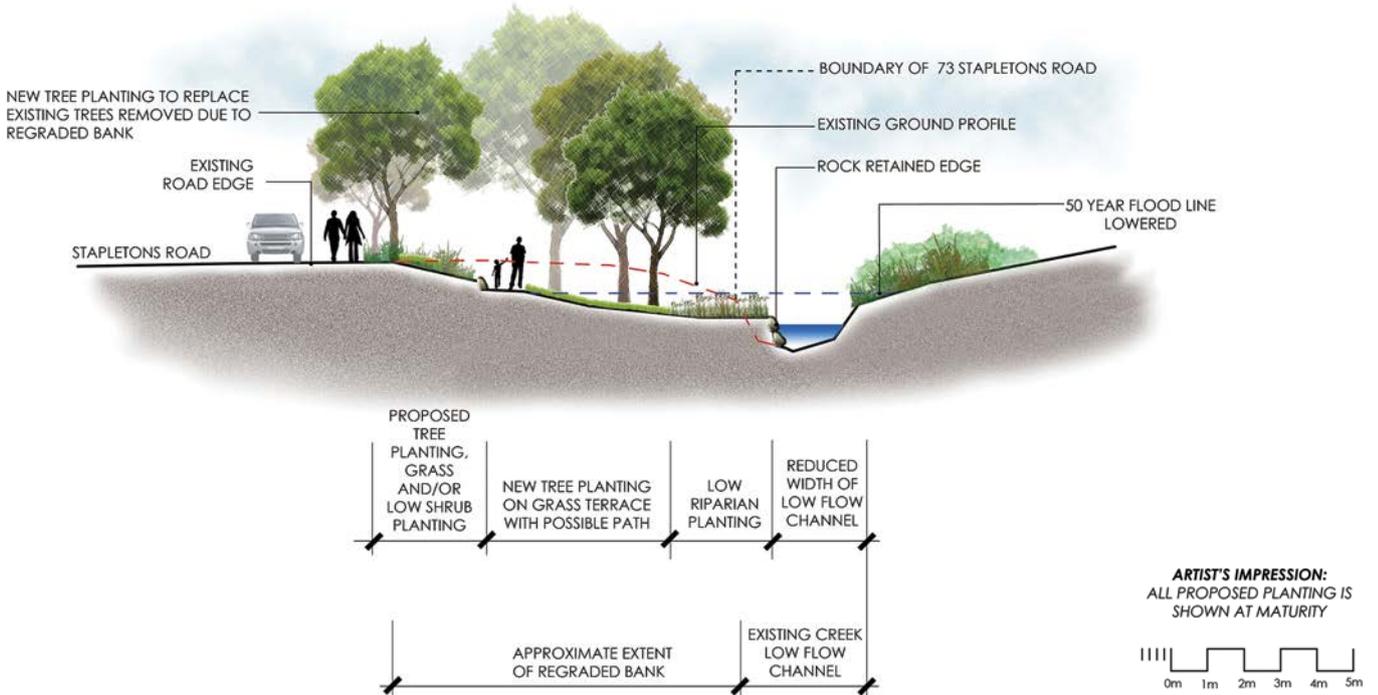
Downstream Option C – Cross Section C (looking downstream from 73 Stapletons Road)
